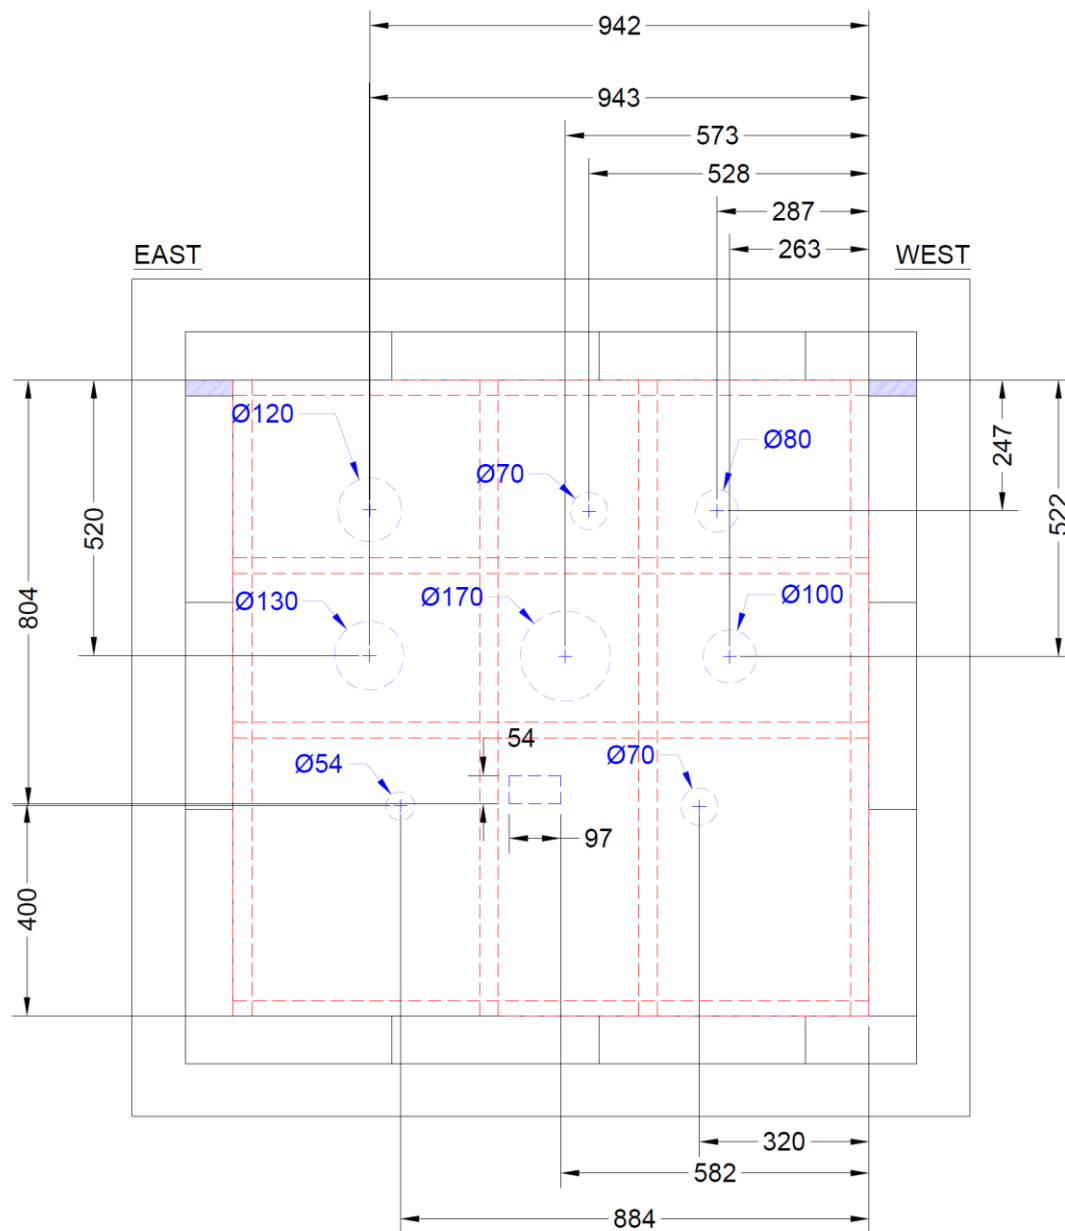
Plan view of test specimen on exposed side (core hole and wall frame)
